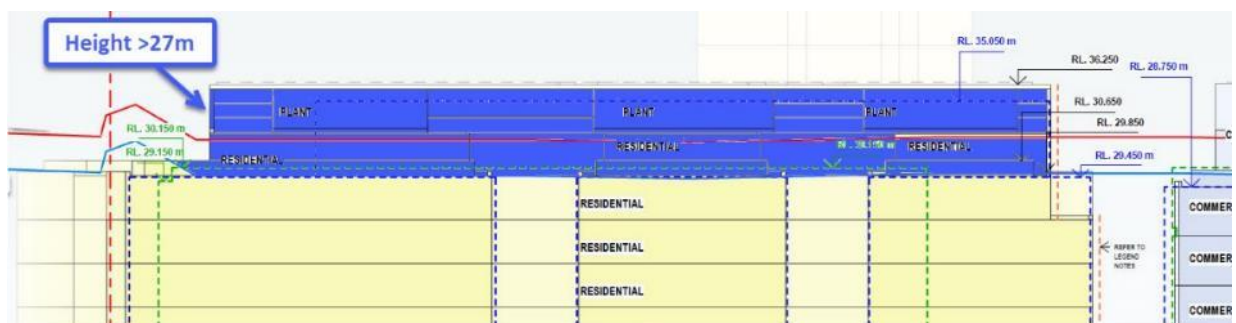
Building C - Wattle Street Section Detail: Height >27m (Sydney LEP 2012, clause 4.3)
